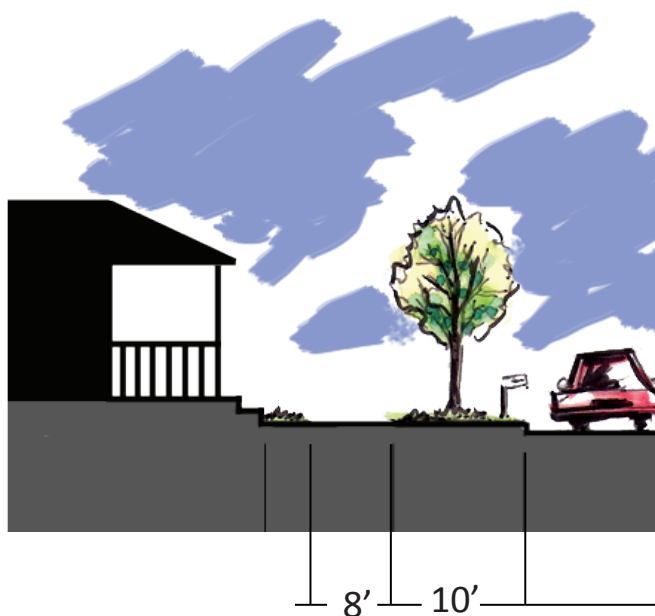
shows a section through Dr. Andrew Brown Street. Where transitions from building to street, to pedestrian was lacking before, new screening vegetation, building and sidewalk signage, and a road-to-sidewalk median has been added. The changes add for more color and textures as well as bringing the streetscape down to the human scale.
